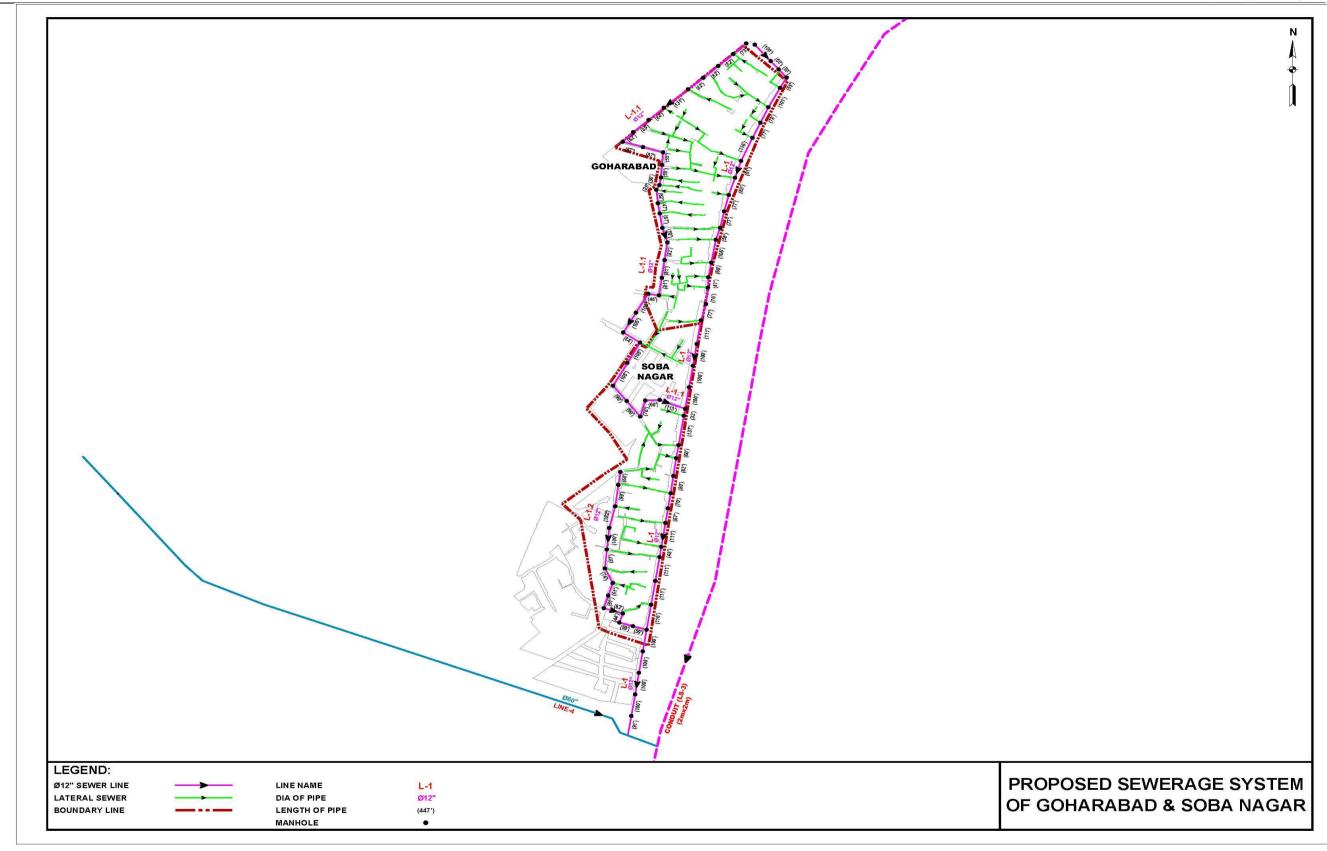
6: Layout Plan of Proposed Sewerage System in Sobanagar/ Goharabad
